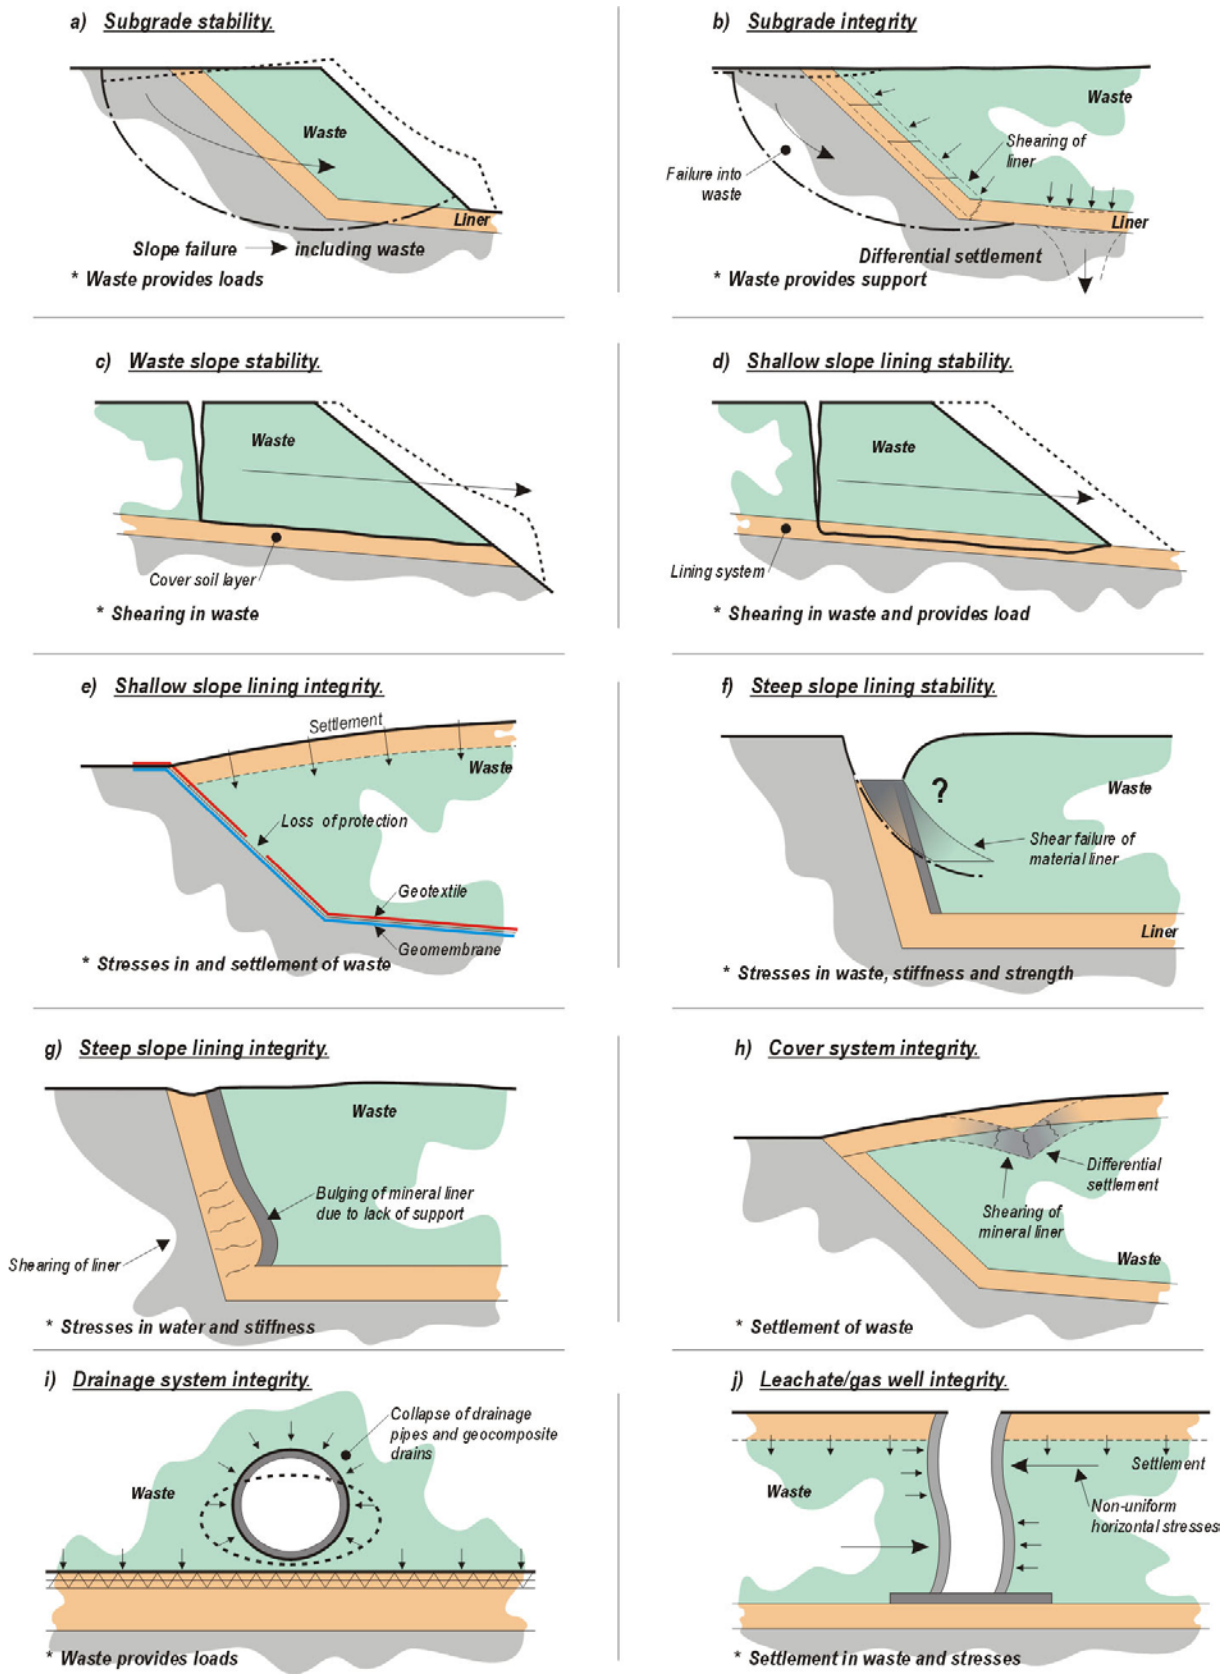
Potential landfill infrastructure failure modes: stability and integrity
